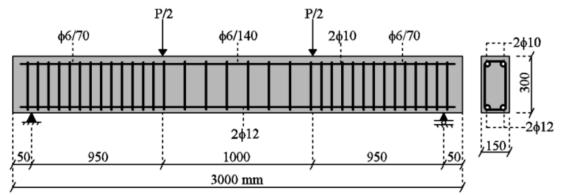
Simply supported reference reinforced concrete beam cross-section dimensions and reinforcement layout (REF)
